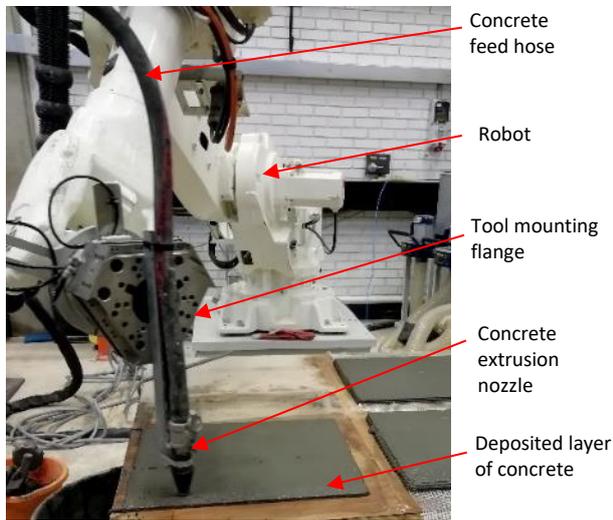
Photograph of the Hybrid 3DCP robot in deposition mode.
